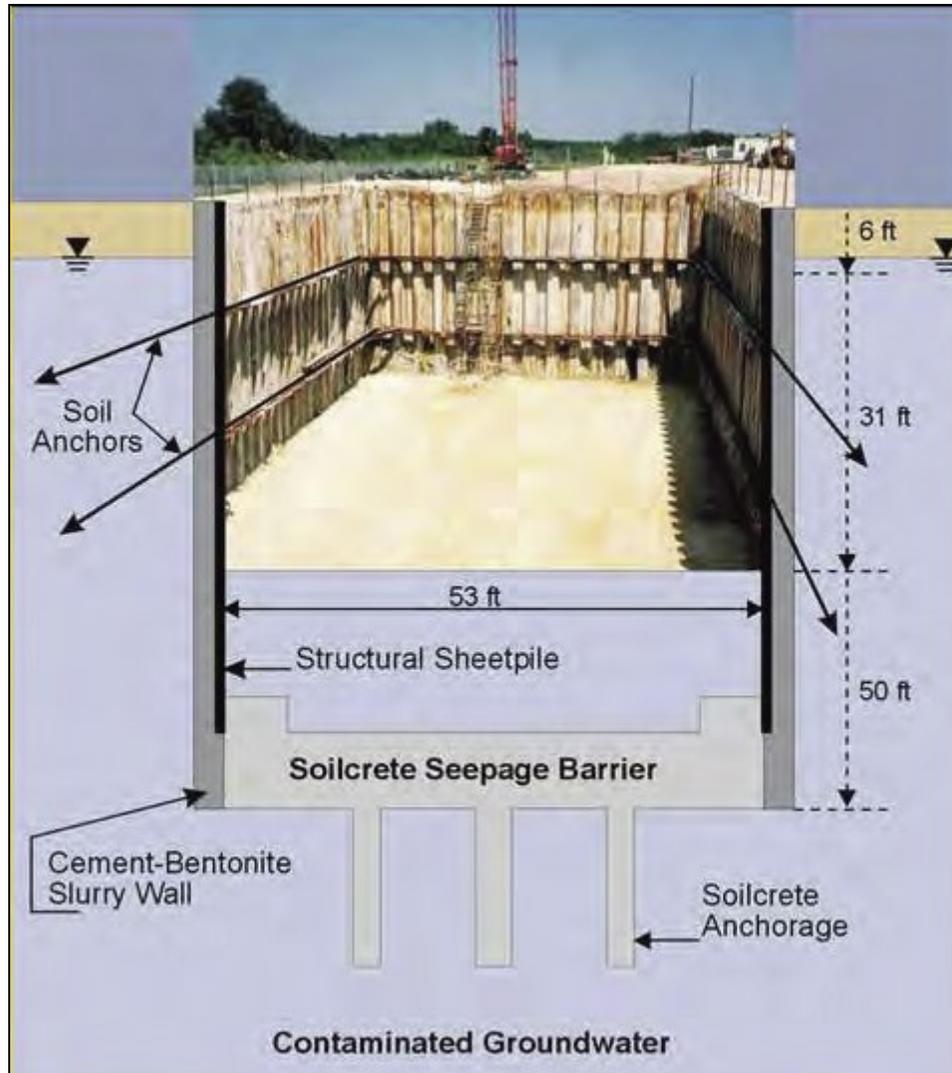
Jet-grout bottom seal and anchorage system for sheet pile cofferdam near Jacksonville, FL (Courtesy of Keller)
